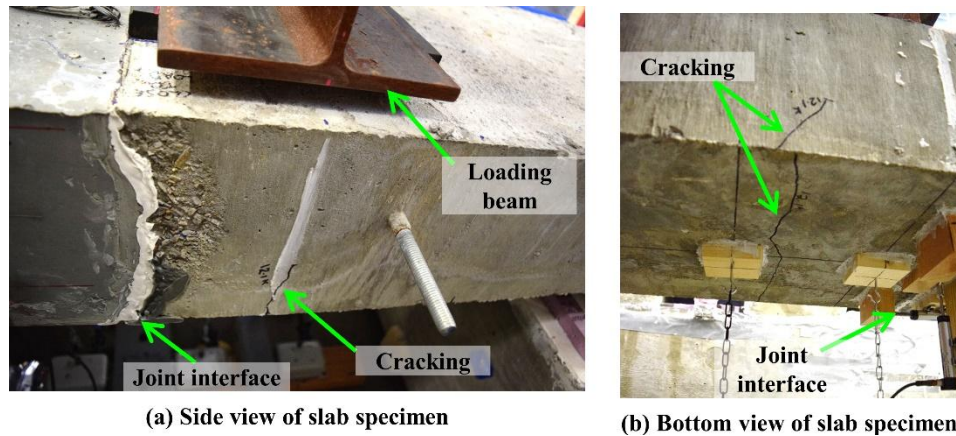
Typical cracking in Slab-DL specimens during test S3
